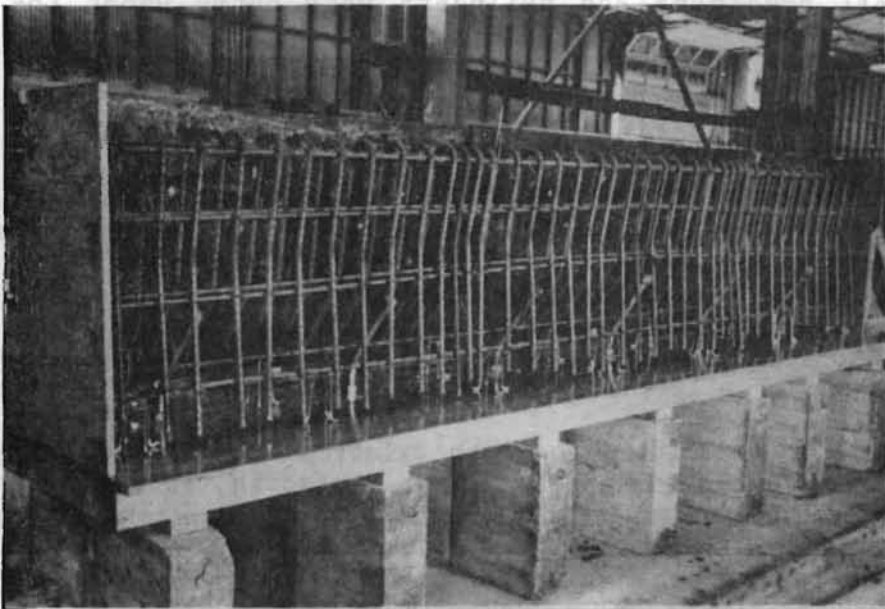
Precast barrier formwork prior to placement of back face barrier form
